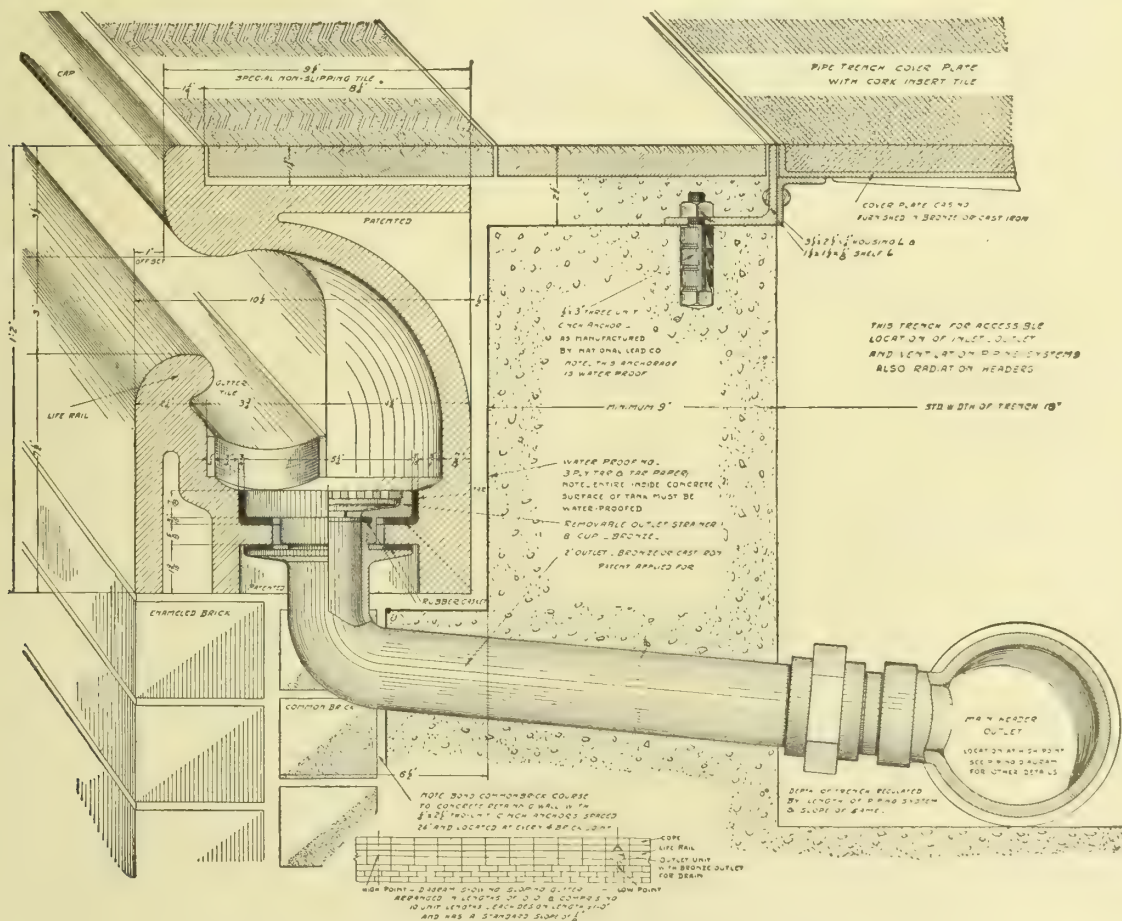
Terra Cotta Outlet Section, with Bronze Outlet Piping Connections to Trench 1915 MODEL DESIGN NO. 6250, WITH OFFSET CAP (PATENTED)
